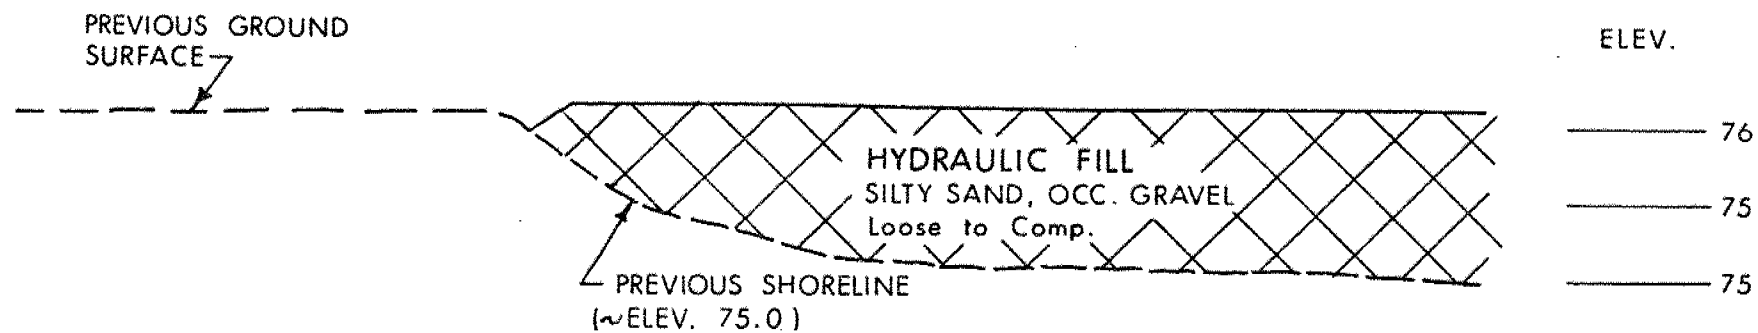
TYPICAL SECTION FROM STA. 15+325 SOUTH
